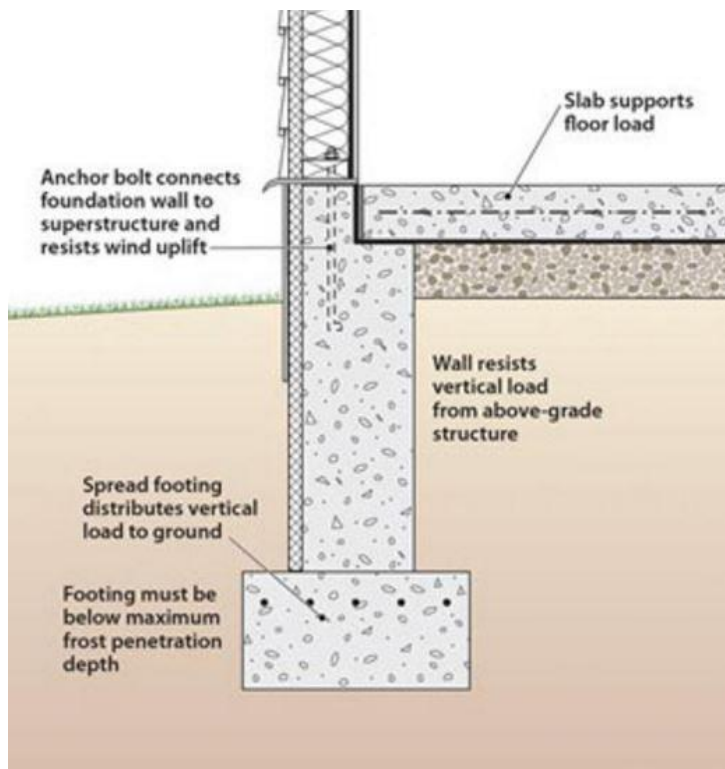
, Structural components of Strip foundation with spread footing, www.thefoundationexpert.com
